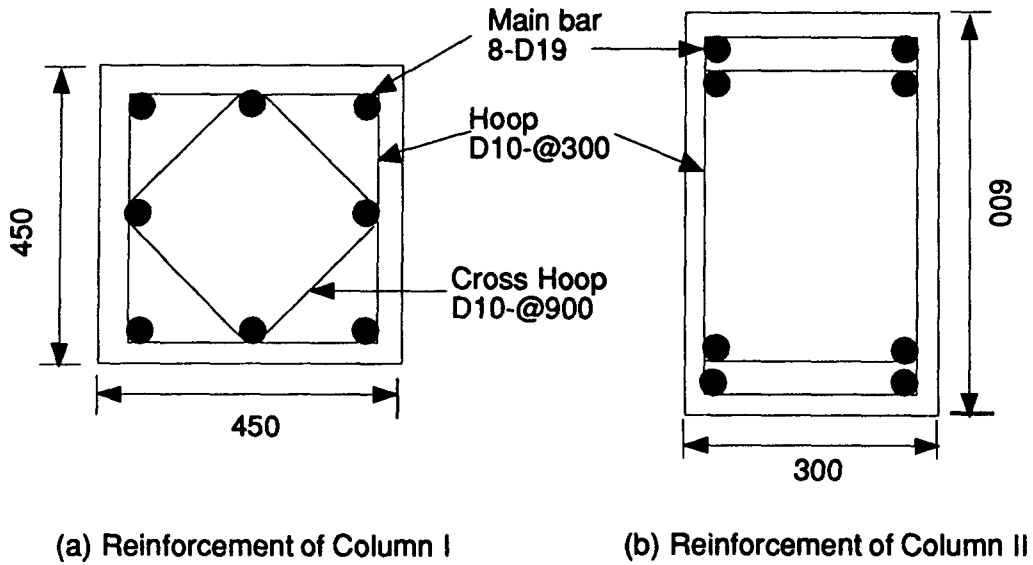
Diagram Showing Reinforced Test Specimen Column
